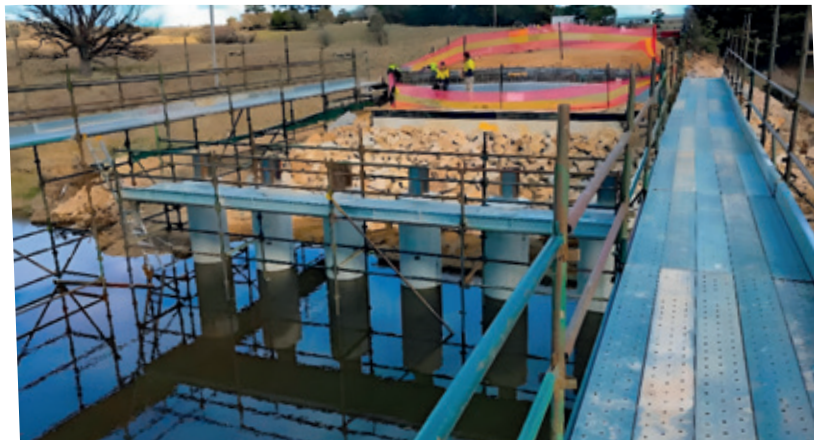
Safety rails and platform are erected on one side of the piles after the pile concrete is cured
